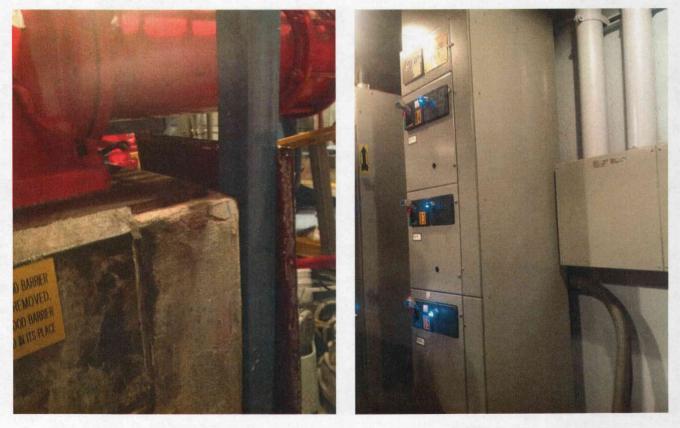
Damaged Grout Photo 2 Movement of MCC Restrained by Adjacent Component
